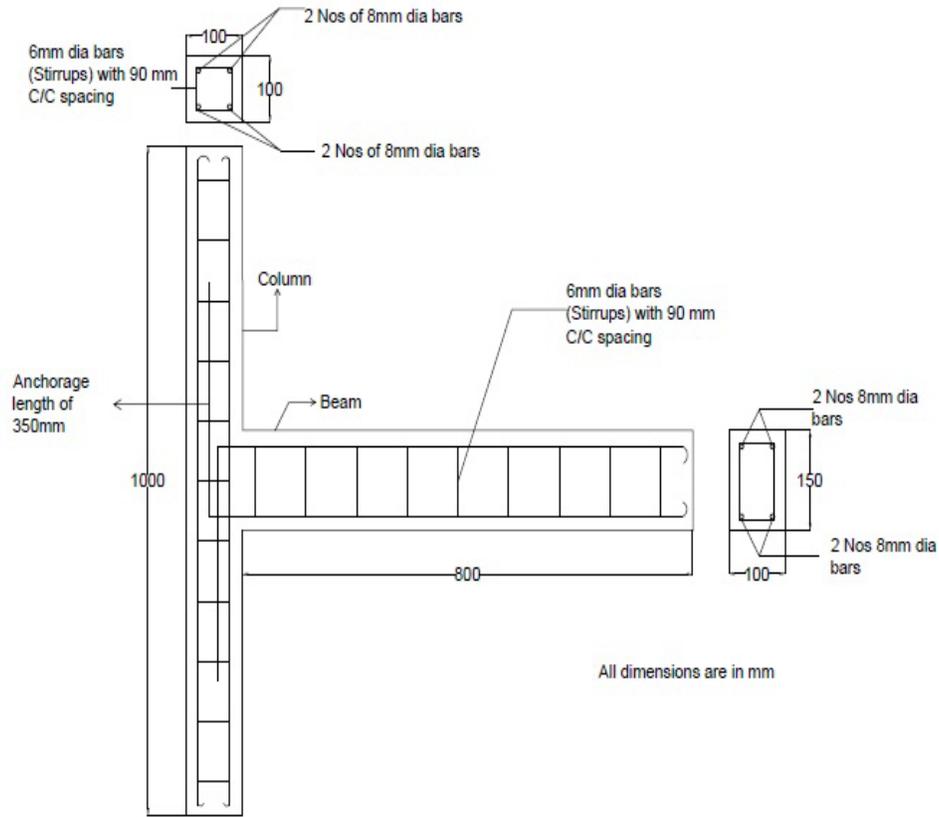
Reinforcement detailing of exterior joint of beam-column
